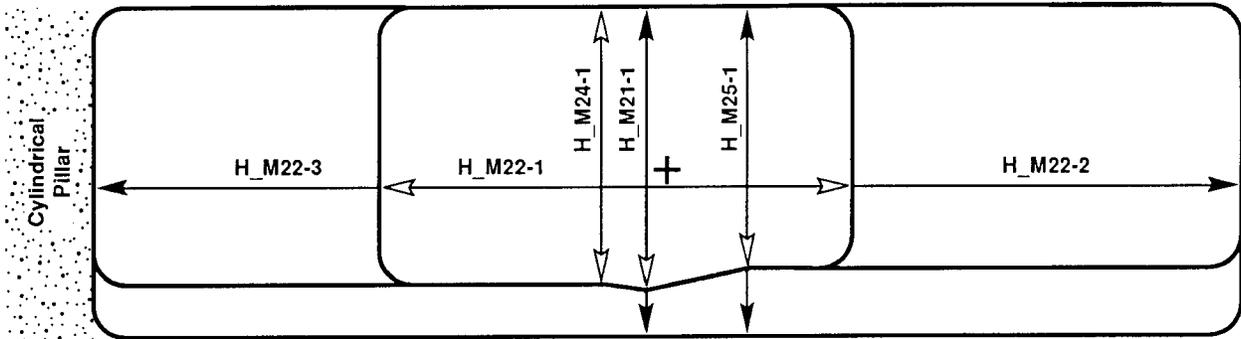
Mining Sequence Gage Cross Sections, Room H and Entry
